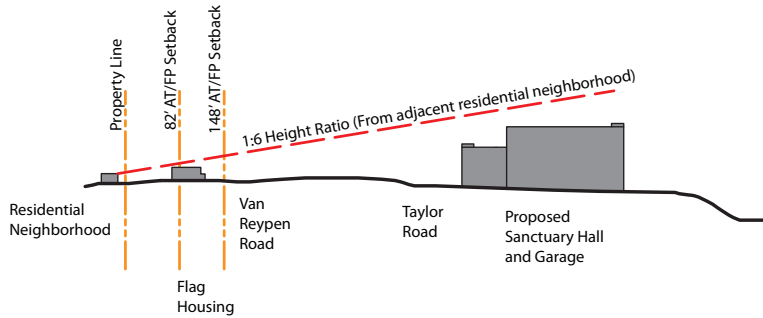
SECTION C- RECOMMENDED BUILDING ENVELOPE FOR NORTHEAST CAMPUS AREA- VIEW TOWARD EAST
